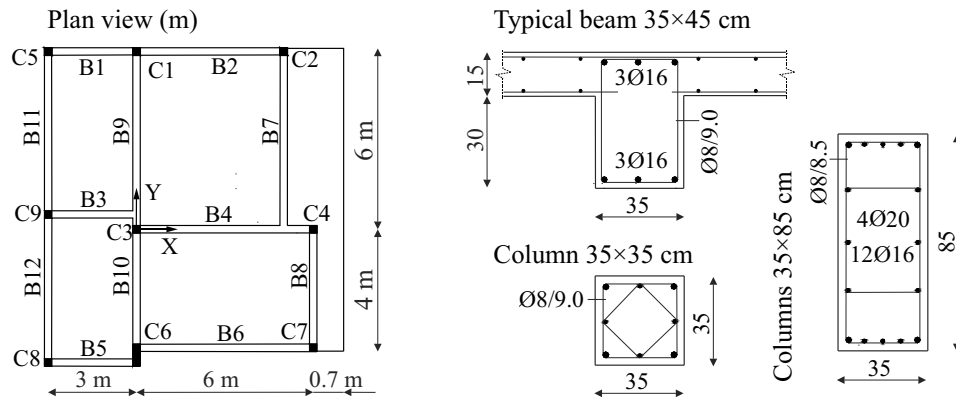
The plan view of the building and typical cross-sections of the columns and beams.
